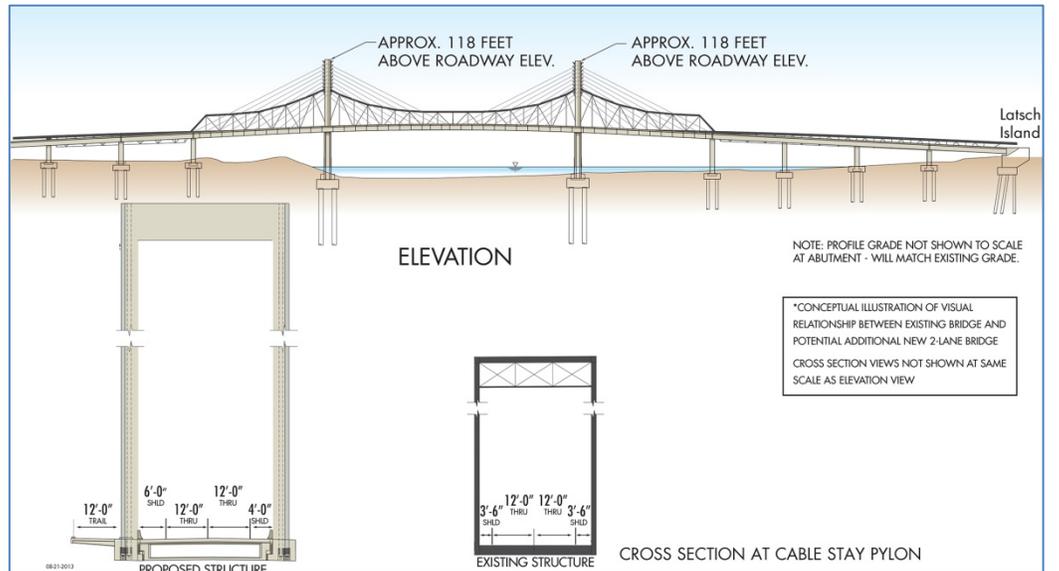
Cable Stayed Bridge Type. Concept Elevations and Cross Sections in Relation to Existing Bridge.
